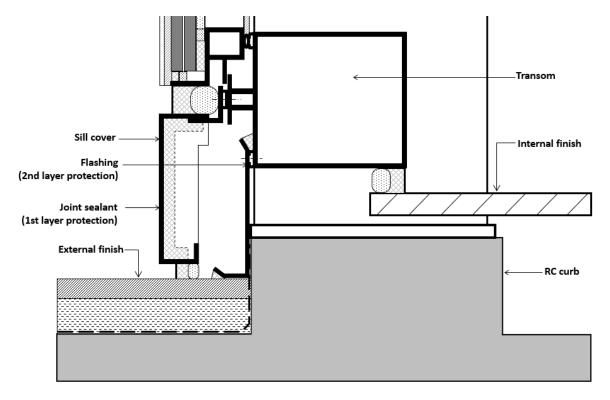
Drawing illustrating double layer protection at bottom flashing, in this case sealant (1^{st} layer of protection) and flashing (2^{nd} layer of protection).
